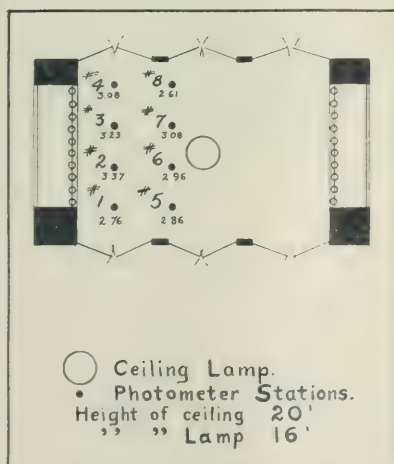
Section plan of first floor, (main entrance), showing location of lighting units, test stations and illumination data.
